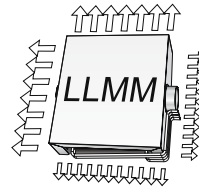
Example of nozzle setting for a single-module unit - LLMM.
